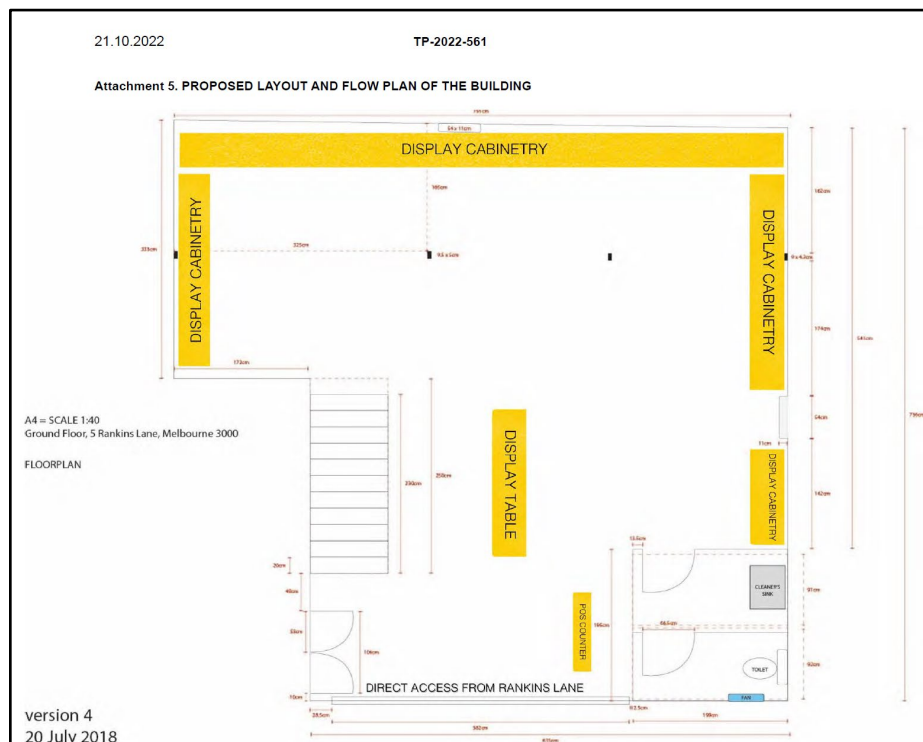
Proposed Ground Floor Plan (Source: Applicant)
